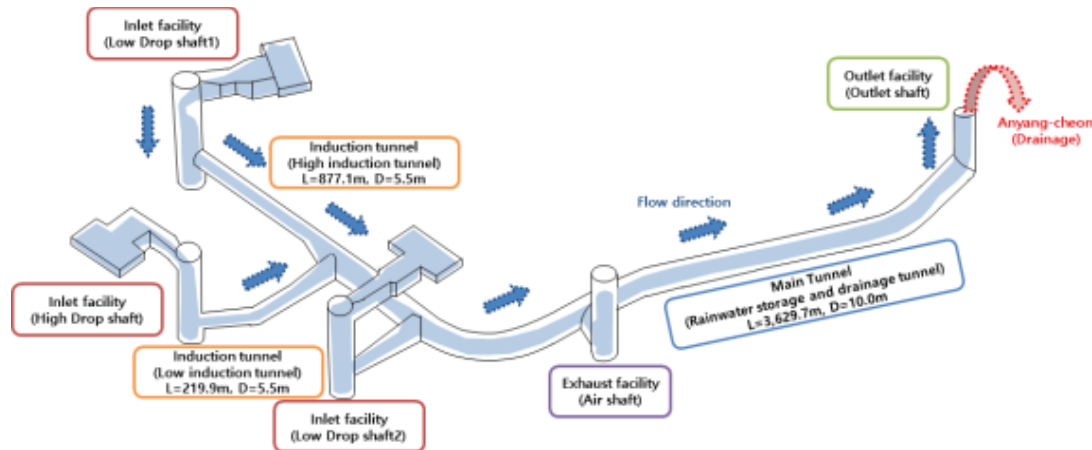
Concept of construction for the Shinwol rainwater storage and drainage system (Hyundai Construction and Engineering).
